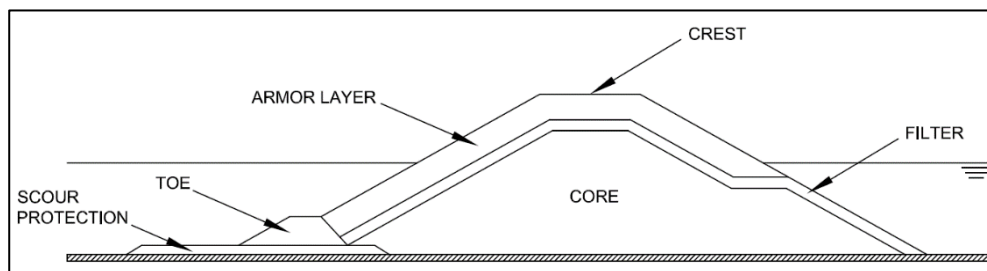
Mound breakwater cross section with toe berm and scour protection apron.
